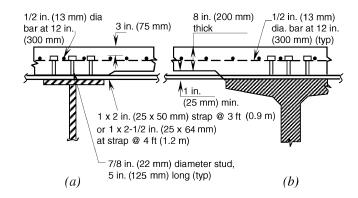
Partial cross section of the ArchDeck slab over a girder: (a) bridge with steel girders; and (b) bridge with concrete girders.
